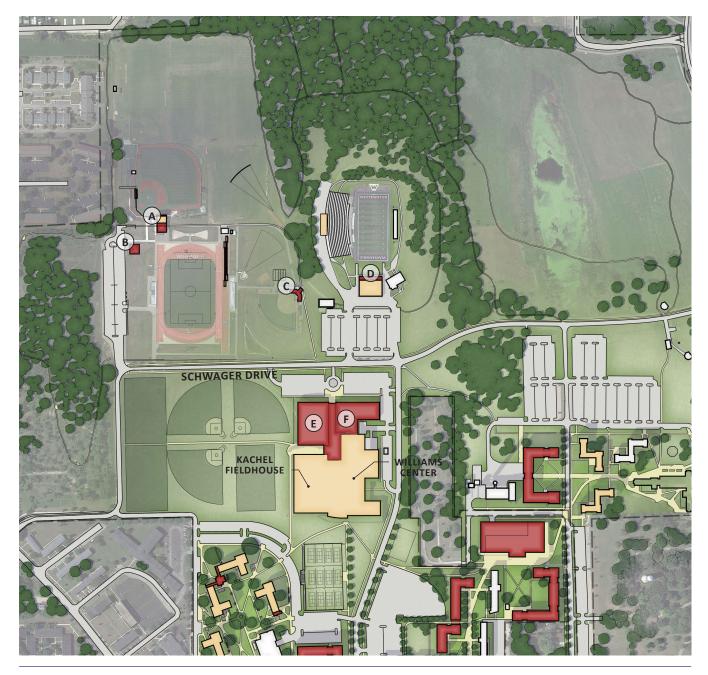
PROPOSED ATHLETIC FACILITIES
